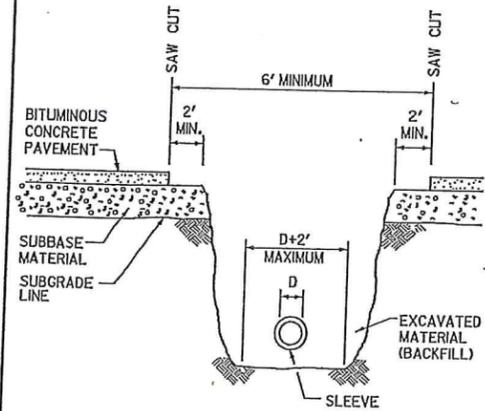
DETAIL "B" JACKING, BORING, AND DIRECTIONAL BORE - CURBED TYPICAL
